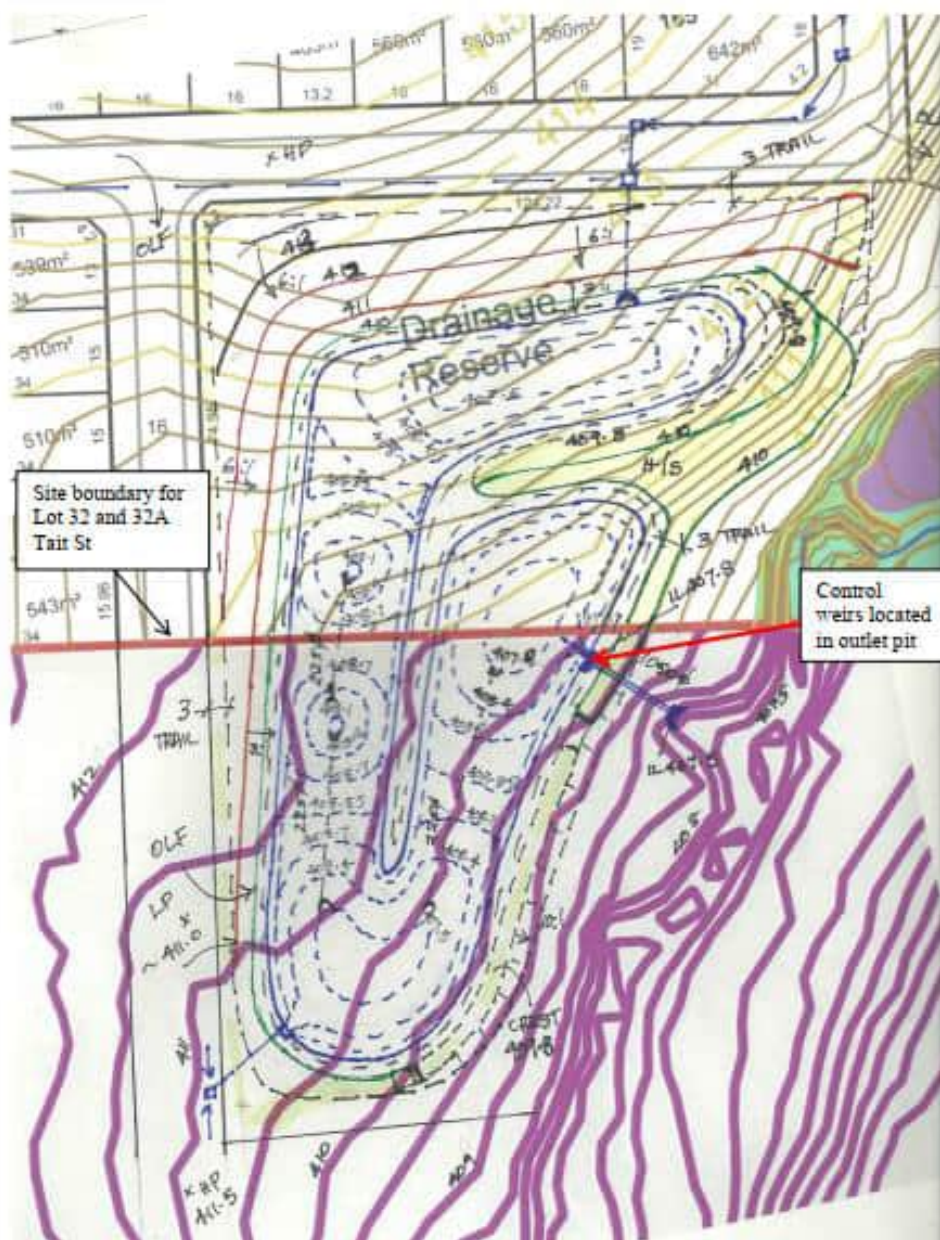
RETARDING BASIN 18 LAYOUT
